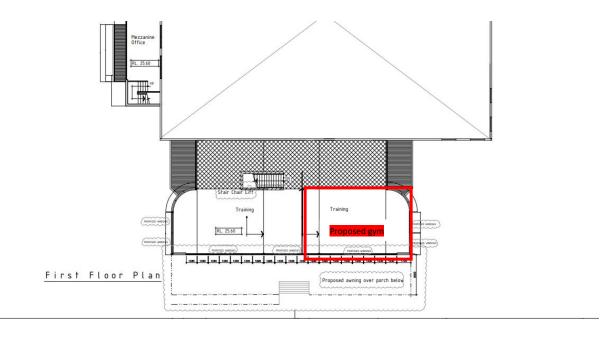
Proposed enclosed balcony and proposed awning with partition walls to separate the space in to tow.
